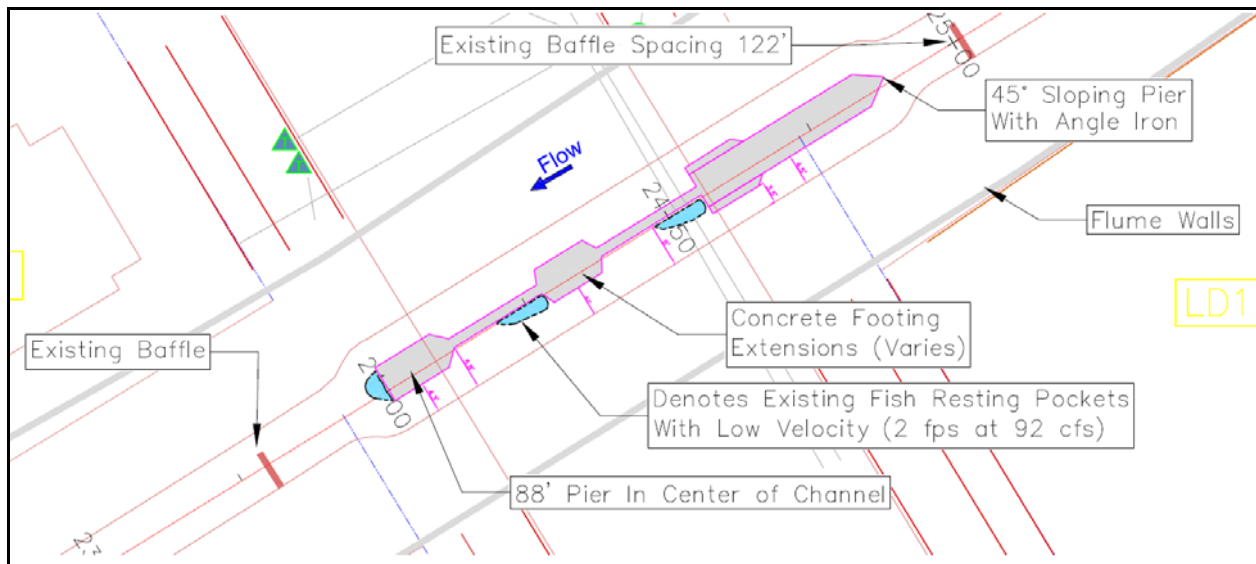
N 5th Ave Bridge Plan View of Existing Layout.
